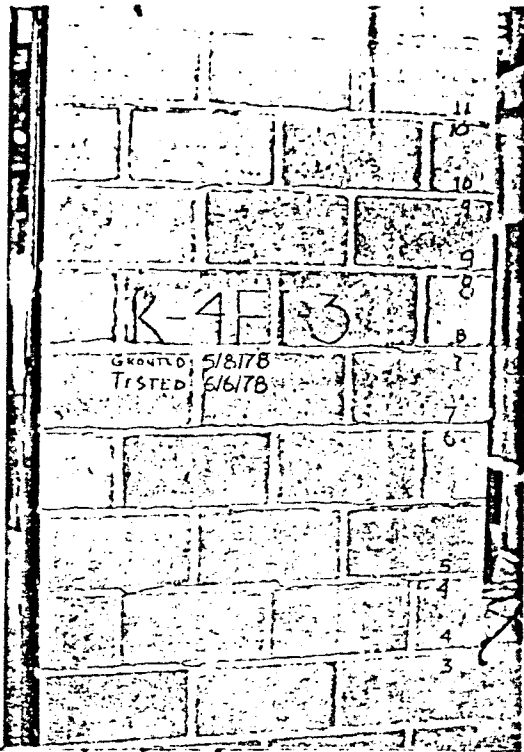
Typical Mortar Bond Separations for specimens containing Korfil Inserts and Reinforced with 1 #4 at 24" on Center.
